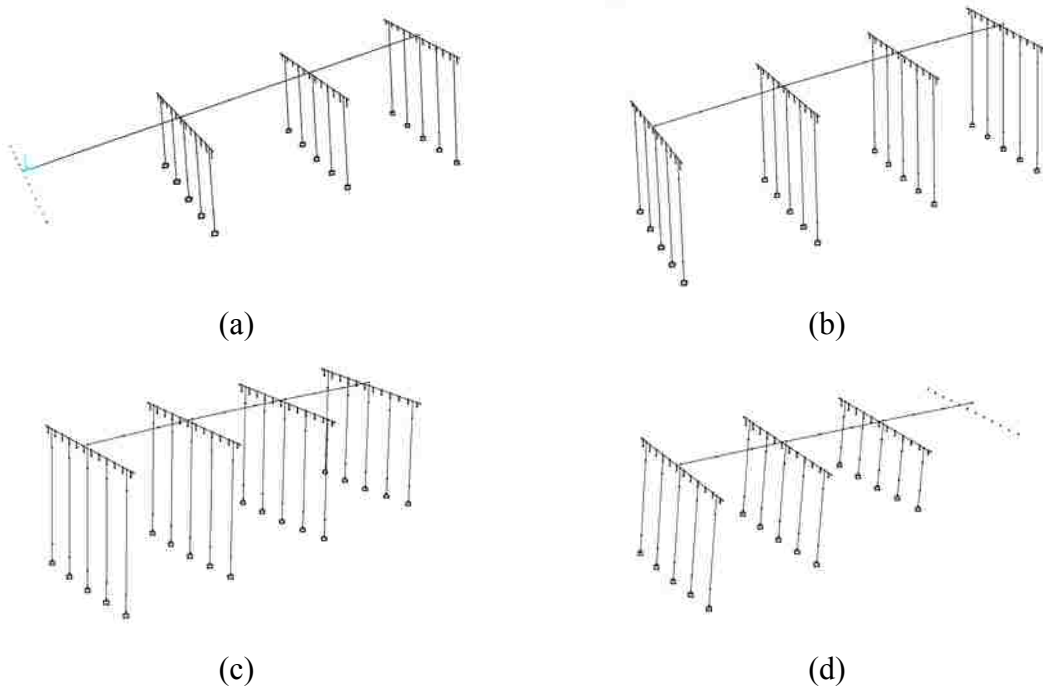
Bridge G-1064 - Structural models for longitudinal direction
